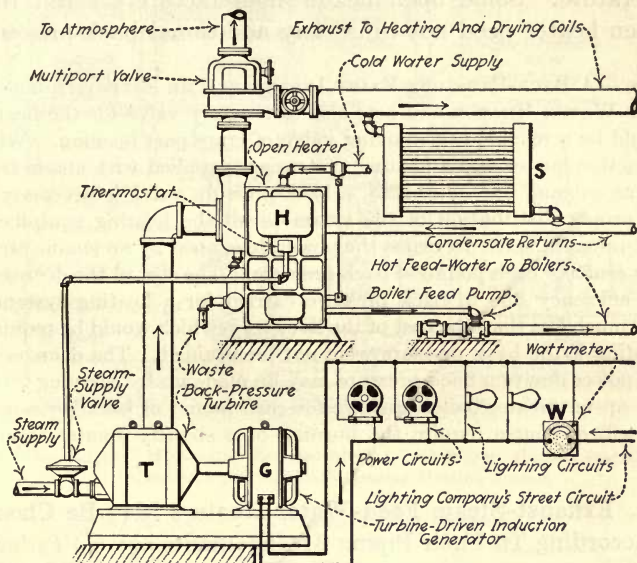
Cochrane Open Induction Heater, *H*, Equipped With Automatic Thermostatic Valve, Used For Exhaust Steam-Heating System.
